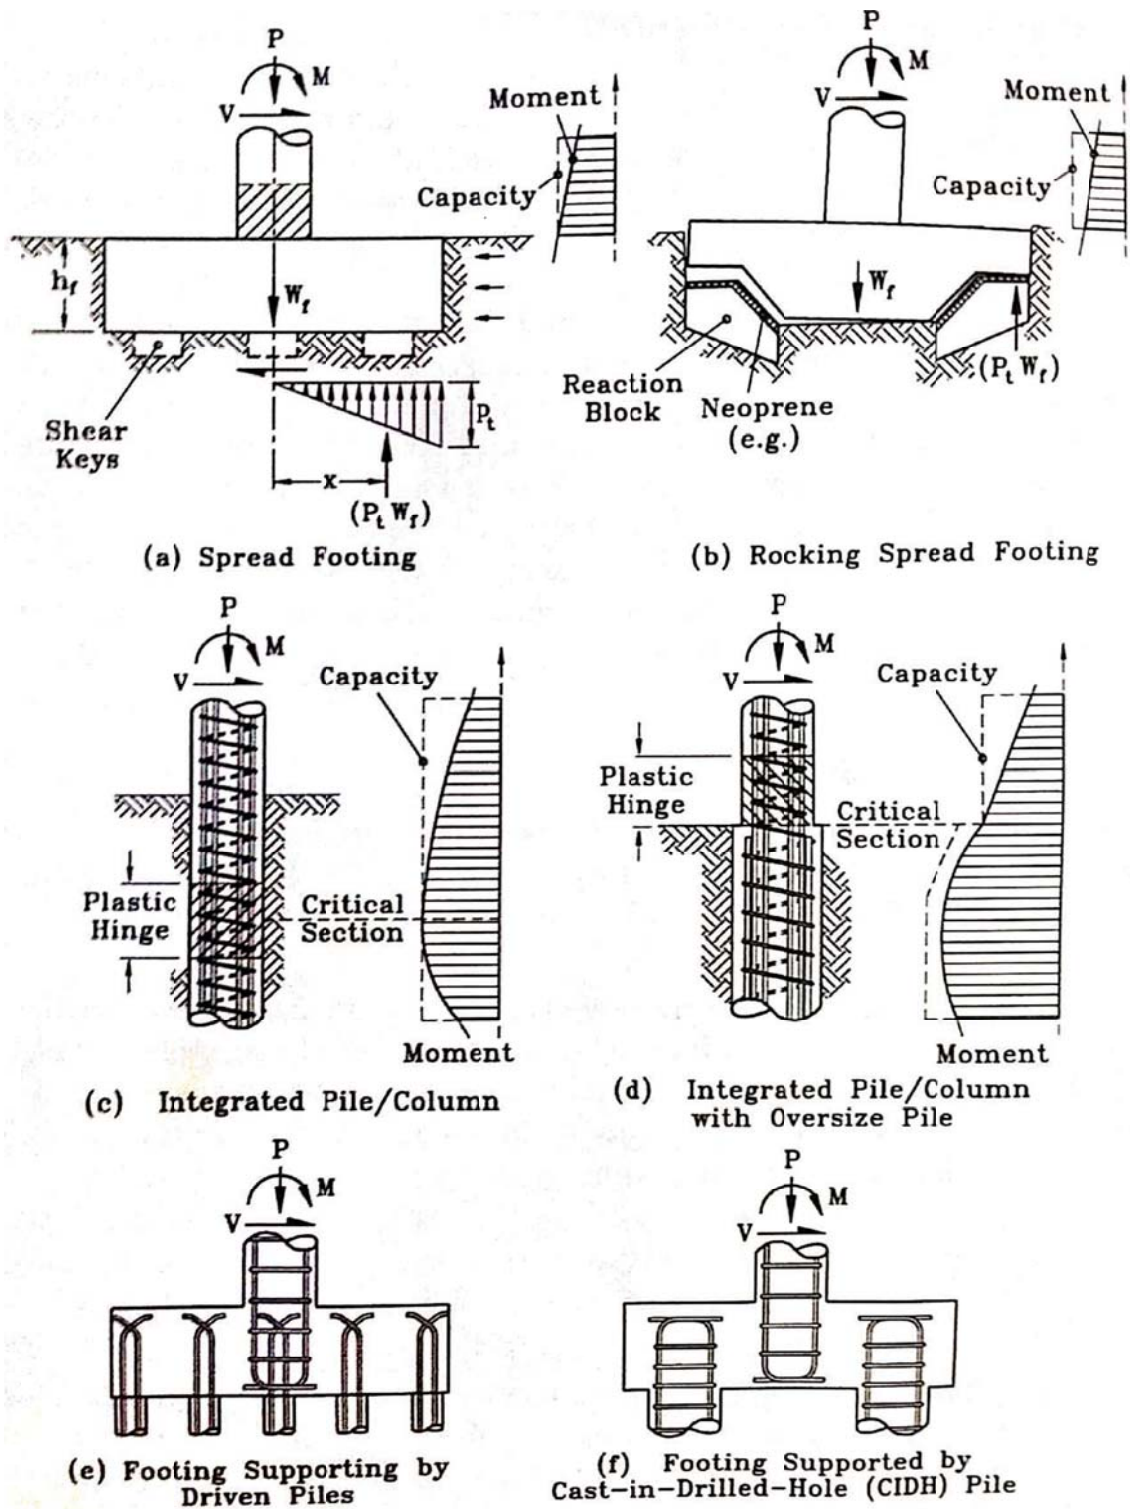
Bridge foundation types (Source: Priestley et al., 1996)
